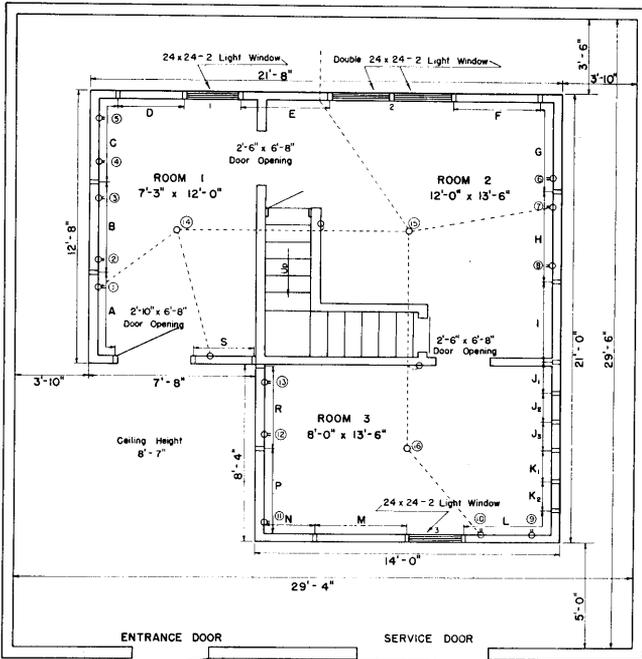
PLAN VIEW OF TEST BUNGALOW WITHIN COLD ROOM.
